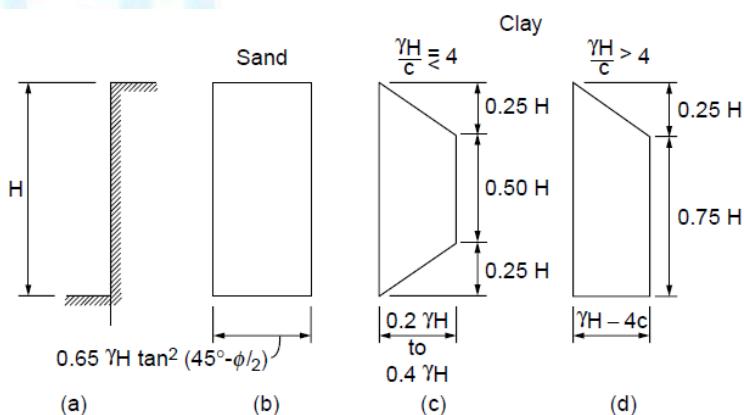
Lateral pressure distribution for computation of strut loads in braced excavation systems. (After Terzaghi, K., and Peck, R. 1967. *Soil Mechanics in Engineering Practice*. John Wiley & Sons, New York. Copyright © 1967 John Wiley & Sons, Inc. Reprinted by permission of John Wiley & Sons, Inc.)
